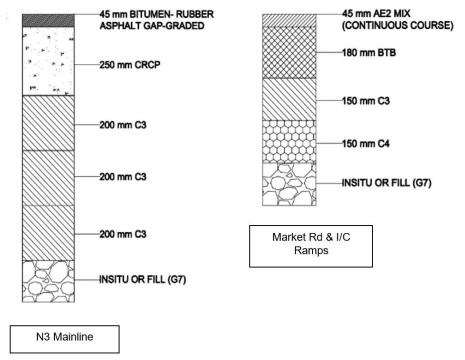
Pavement design structures for the N3 carriageways and for Market Road, Interchange Ramps and cross-roads.
